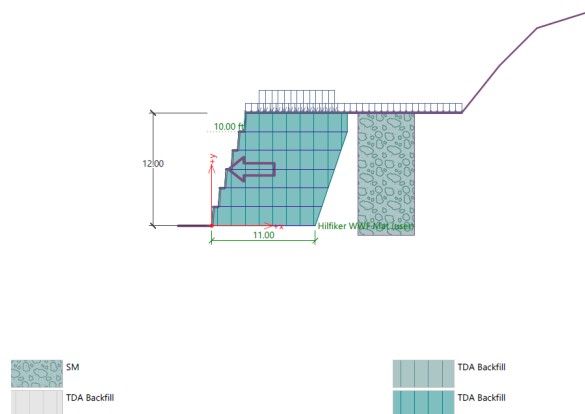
Internal Stability Calculations of the MSTDA Wall at Italian Bar Road Site 6
